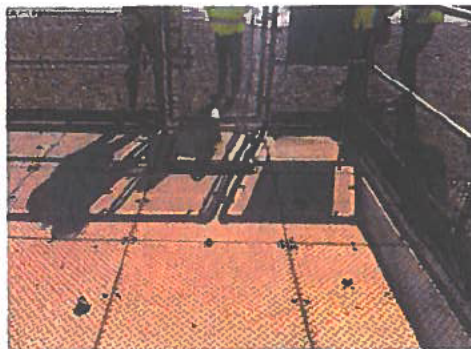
Crumbles Outfall – Outer chamber (Beach) hatch.
